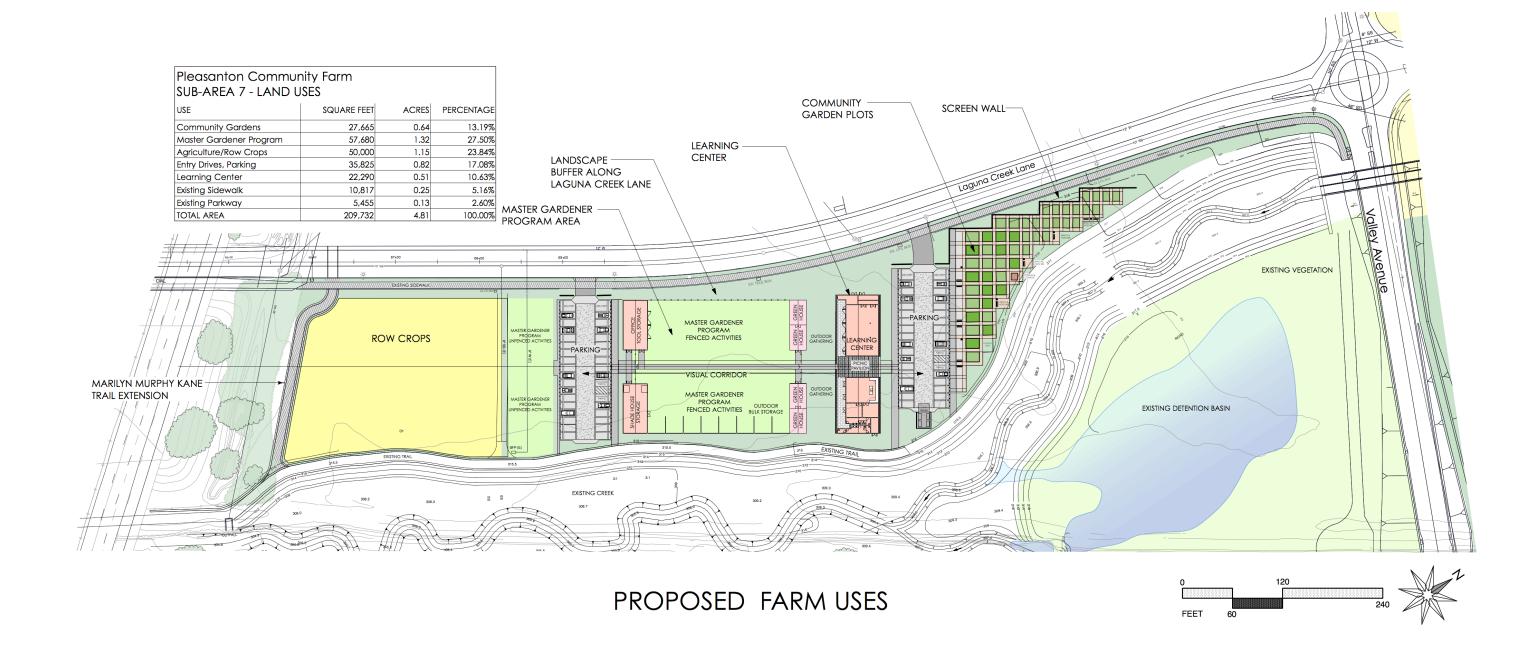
SUB-AREA 7 - PROPOSED SITE PLAN
